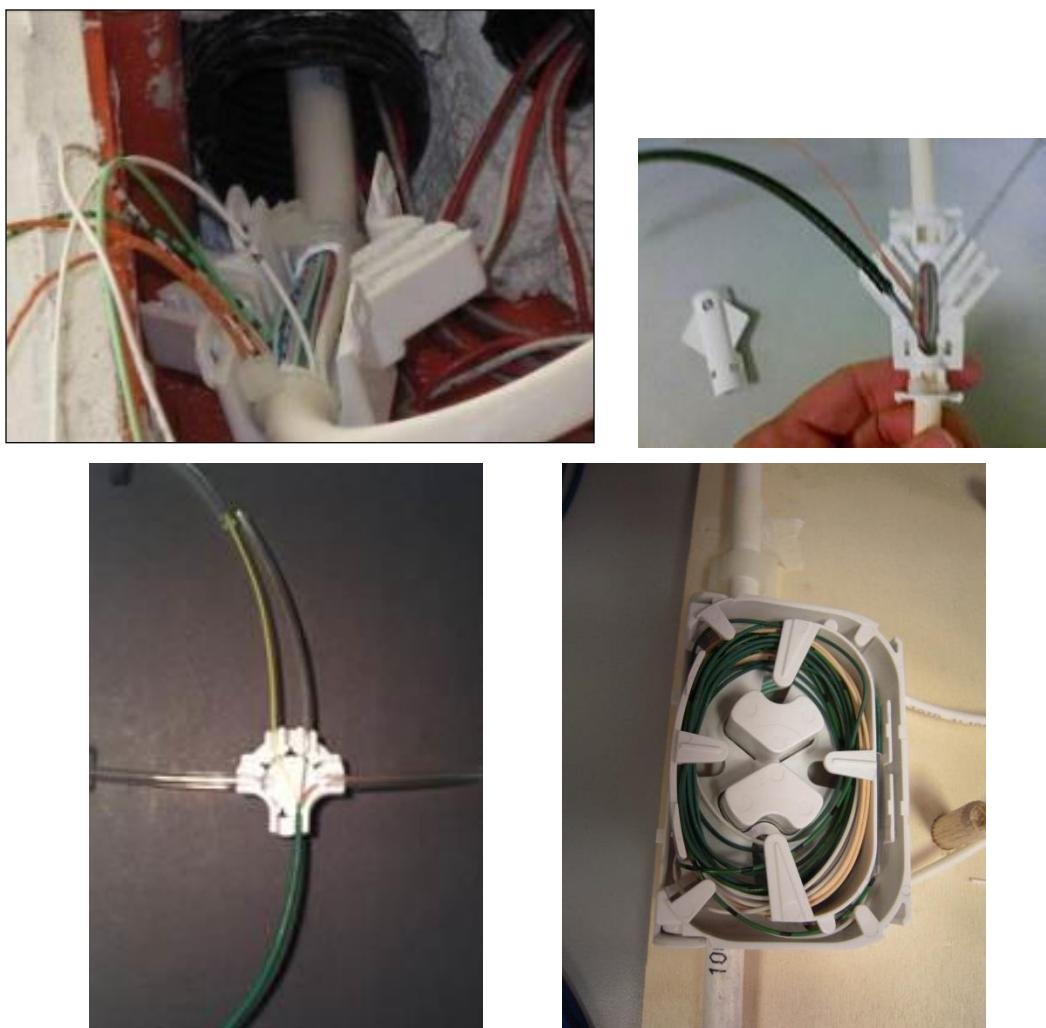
Installation of the fibre protection shell (left – different dimensions are available) with protection tubes or splice box (right)
